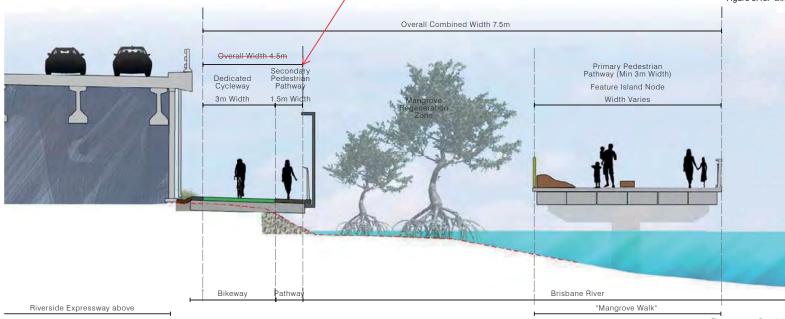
Goodwill Extension Type 2 Sectional Elevation (Not to scale)
